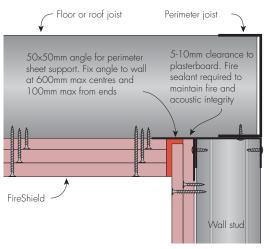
Fire Rated Ceiling to Wall Direct fixed to joist
